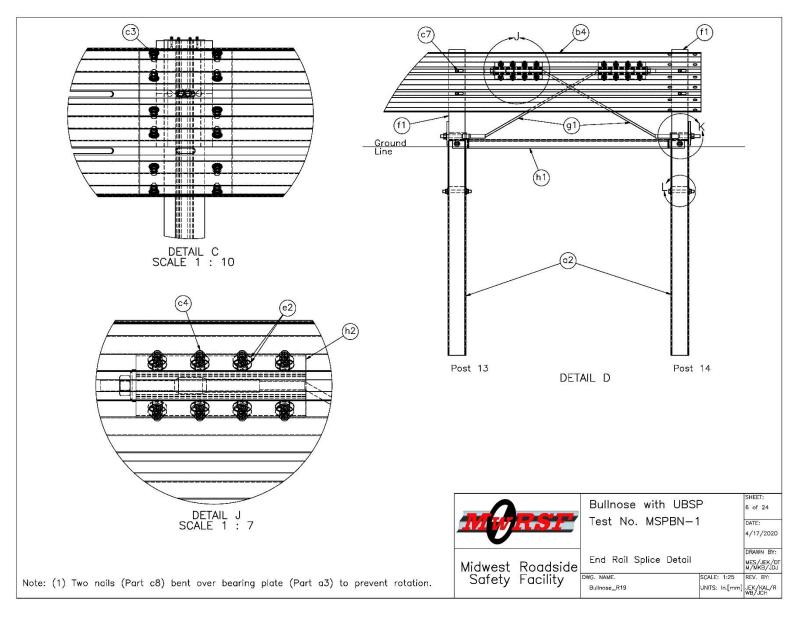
End Rail Splice Detail, Test Nos. MSPBN-1 through MSPBN-3
